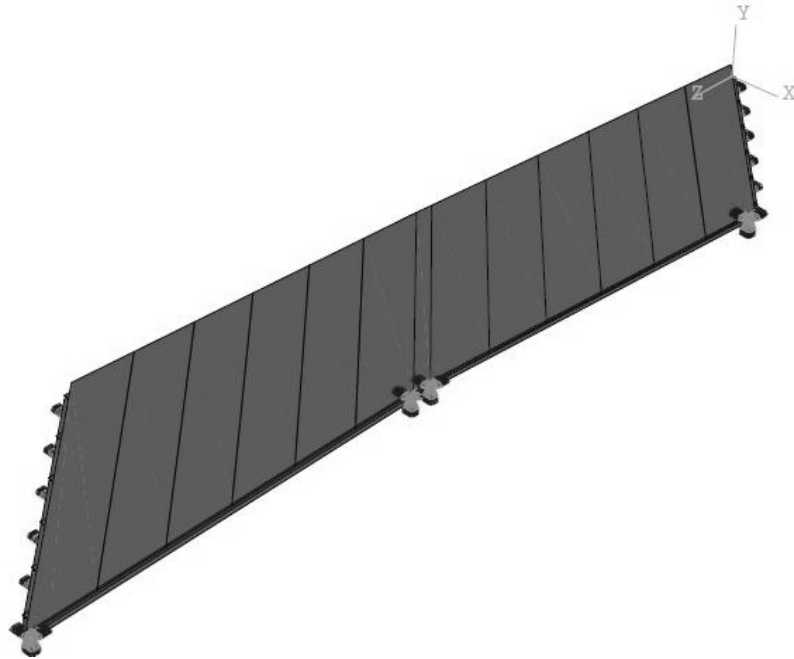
4.2.1.2 Frame, Shell, Brick 3D Model of Superstructure, Structure #314.
